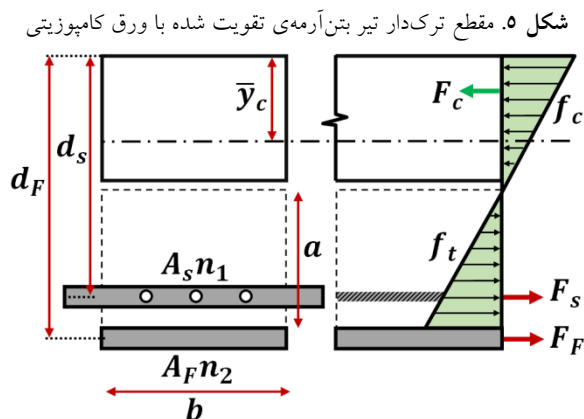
Cracked section of reinforced concrete beam strengthened with composite sheet
